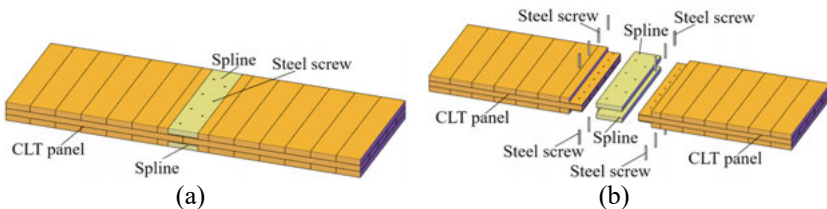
CLT panels with DSS connection, (a) jointed view and (b) installation illustration.
